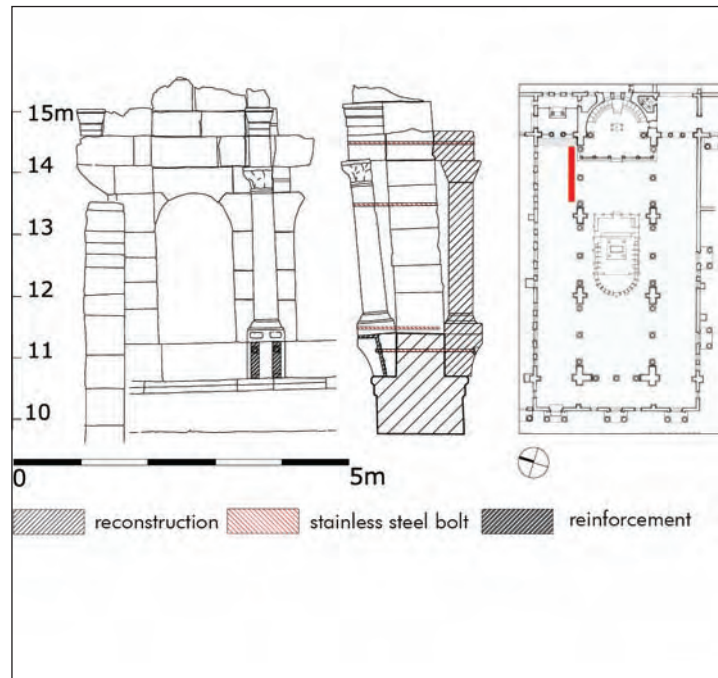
Basilica A, Basilica A, clerestory of the north nave wall, stabilising of a column threatening to collapse and reconstruction of a column on the opposite side due to structural reasons (T. Horn, 2010).
